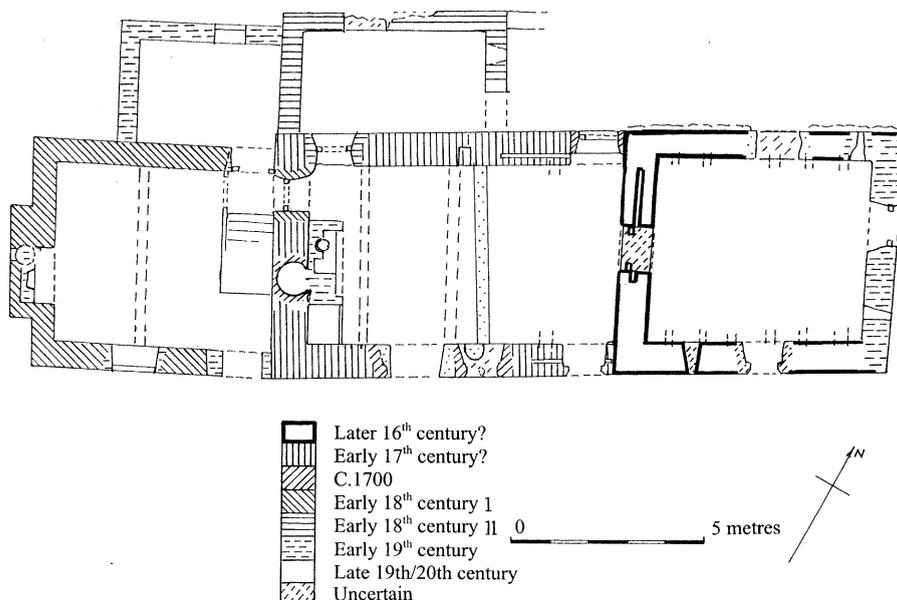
Steel, 'The Tenement'. Provisional Phased Ground Plan (1:200).
